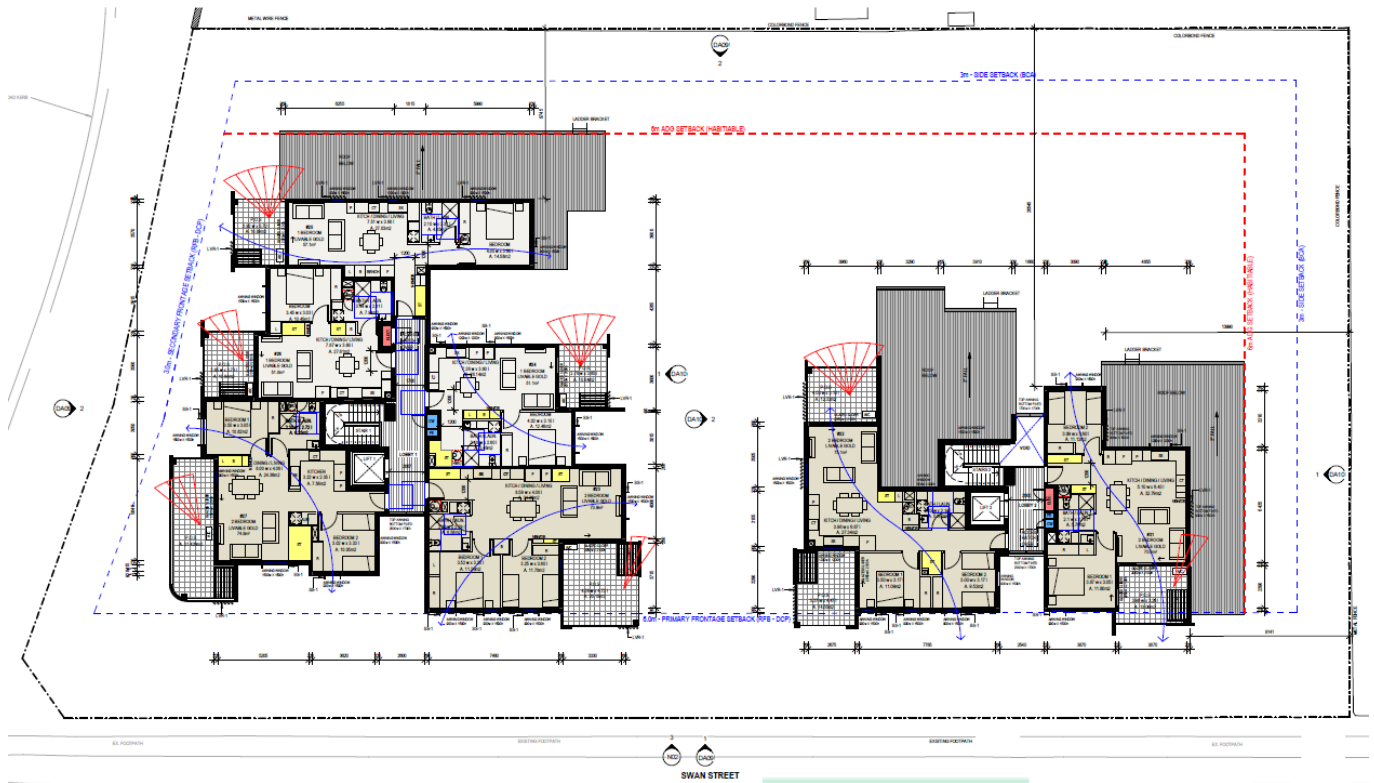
Extract from Architectural Plans – Second Floor Plan Level 3 (Source: Architectural Plans, Brewster Murray Pty Ltd, dated 7/02/2025)
